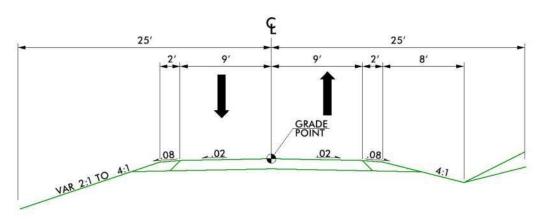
SUBDIVISION ROAD TYPICAL SECTION
